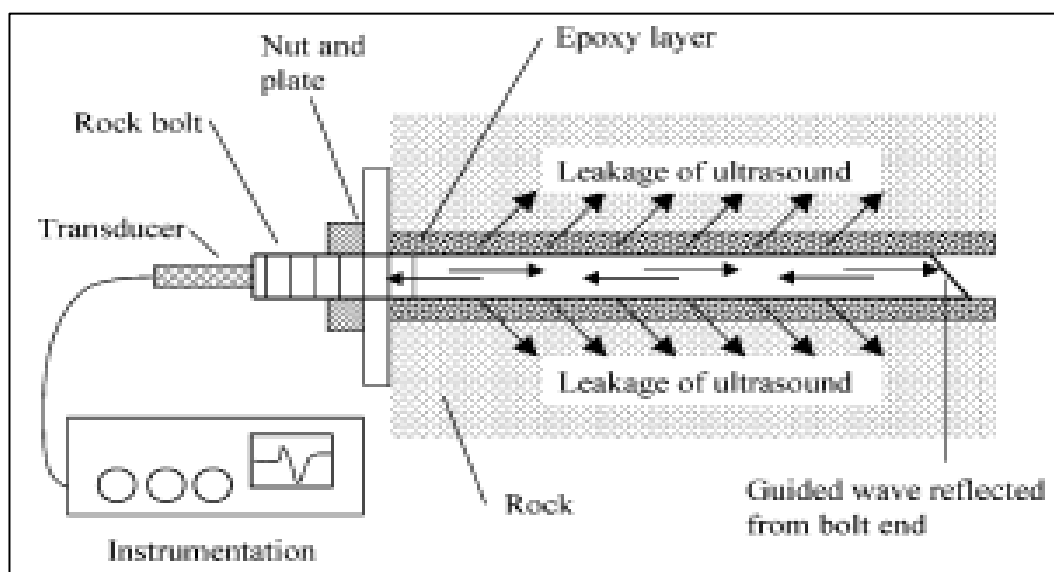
A diagram showing a rock bolt installation and the set-up of the guided wave method (Beard and Lowe, 2003).
